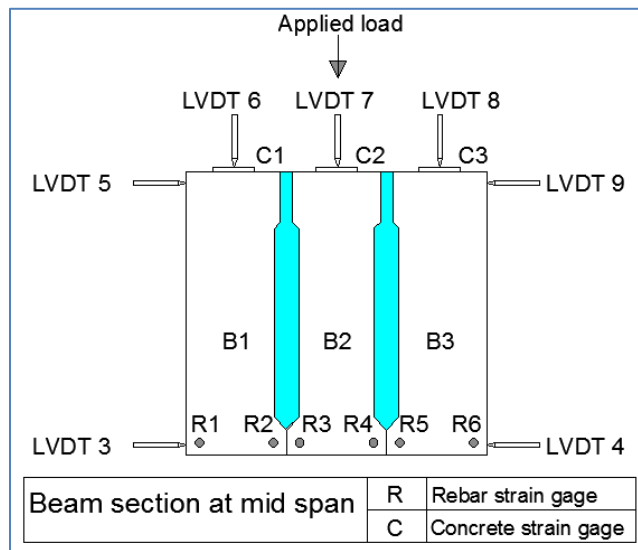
Typical Cross-Section of Beam Assembly at the Midspan
